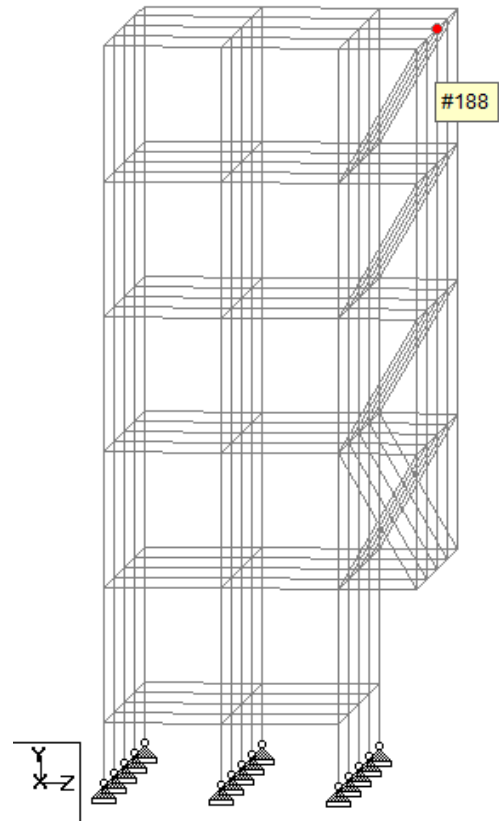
Building Model with overhanging beams with floating columns and X bracing
